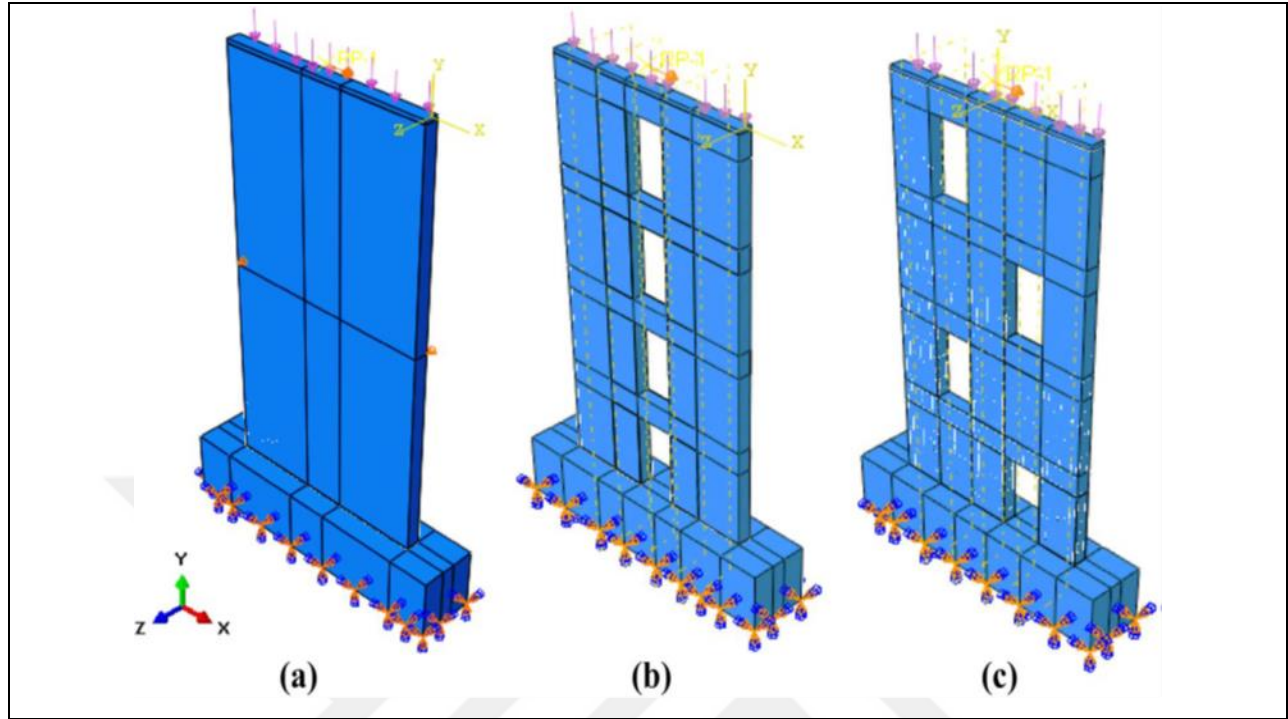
Loading and Boundary Conditions of Wall Specimens [21]
